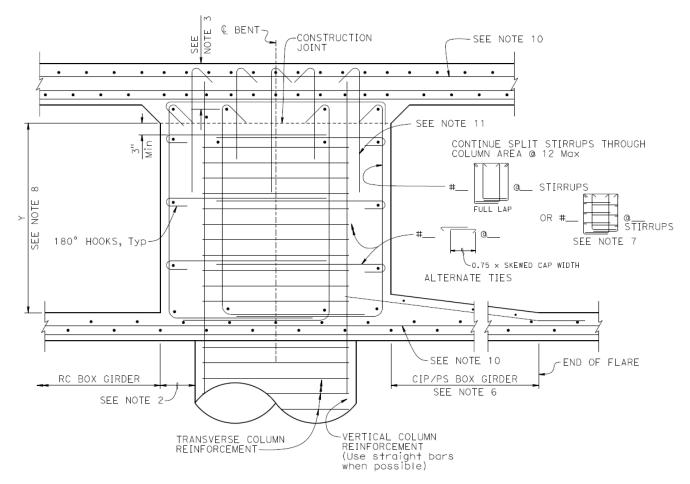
Bent Cap Section at Columns (For details not shown, see Figure 7.8.1)
